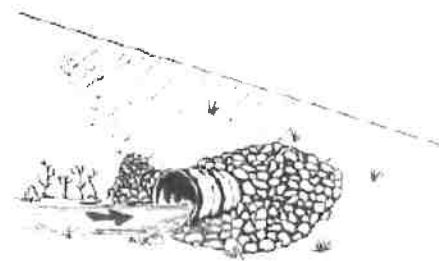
B. Riprap armor at culvert inlet (Keller and Shear, 2003).
